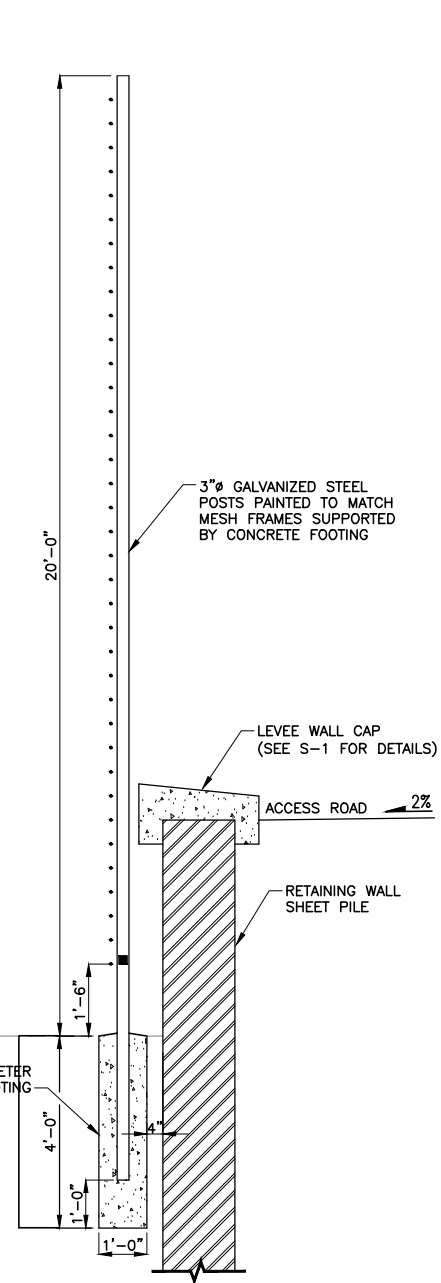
SCHOOL FENCE DETAIL (SCHOOL YARD SIDE)
